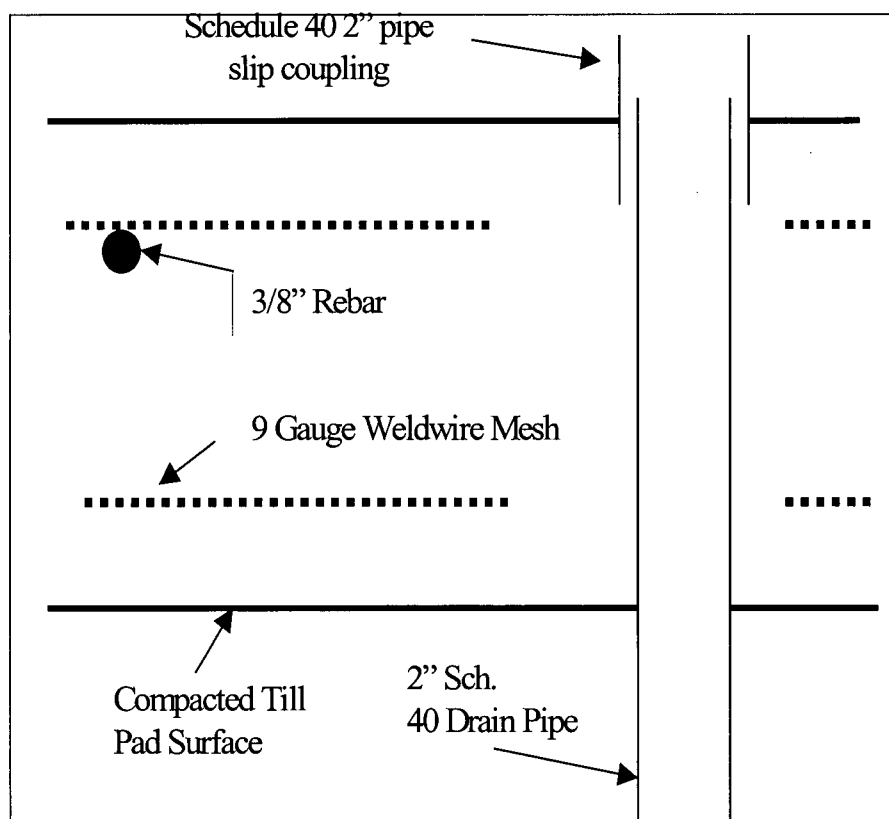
Schematic Cross Section of Concrete Pad Re-enforcement
